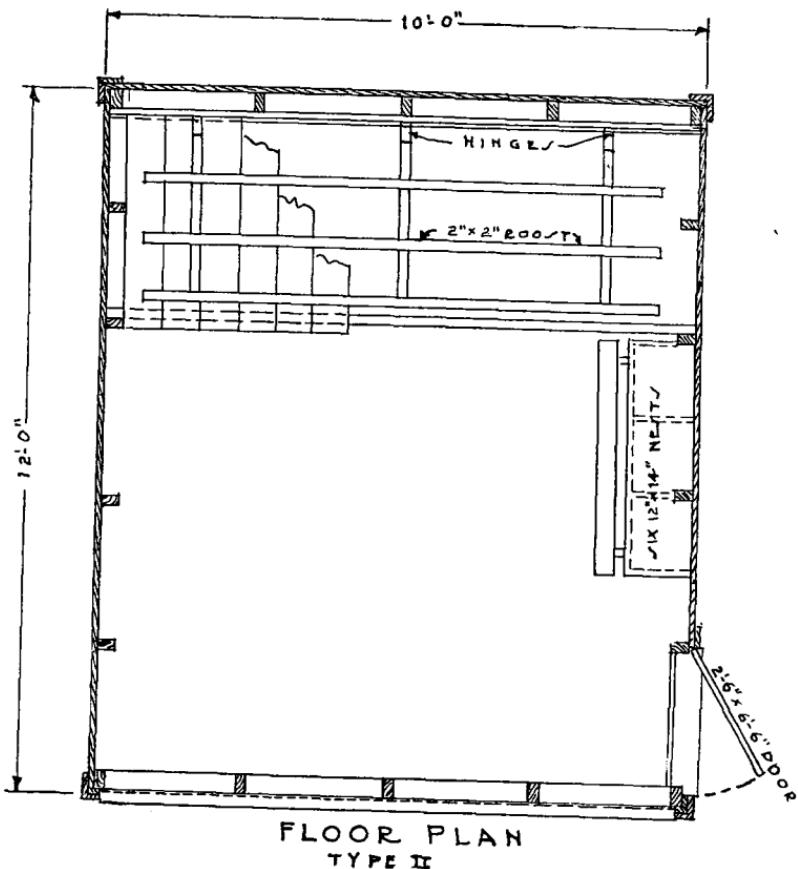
Plans for shed-roof laying house, 10'x12', with drip.
